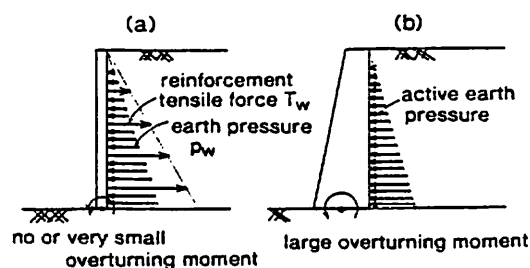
Schematic diagram of the earth pressure and force distribution on the back face of (a) the facing for reinforced or nailed structures, and (b) the conventional RC retaining walls (smooth back faces of the facing are assumed).
